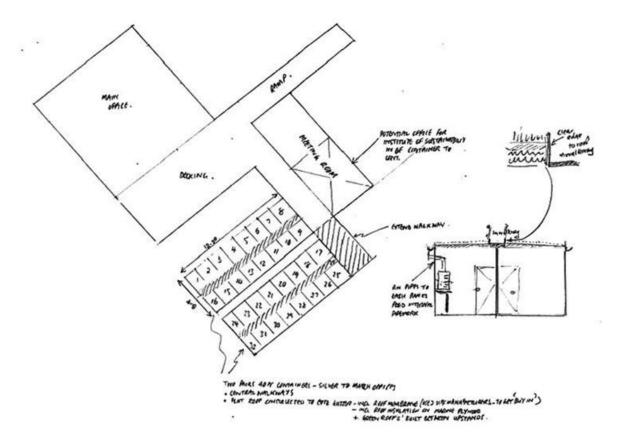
Plan of green roof test bays at Barking Riverside Offices.
